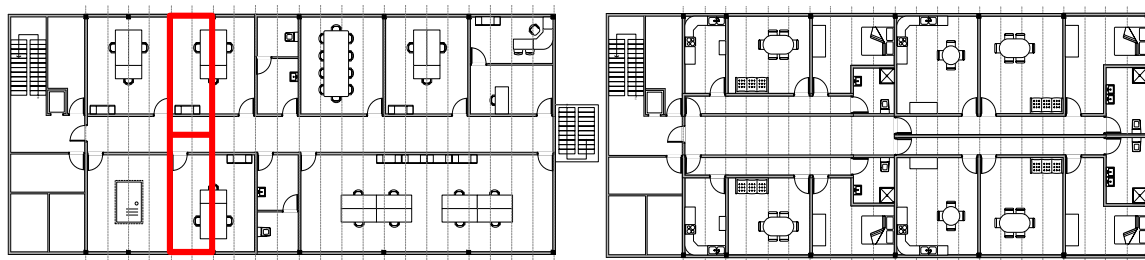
Exemplary floor plan of an office (left) and a residential building (right)
